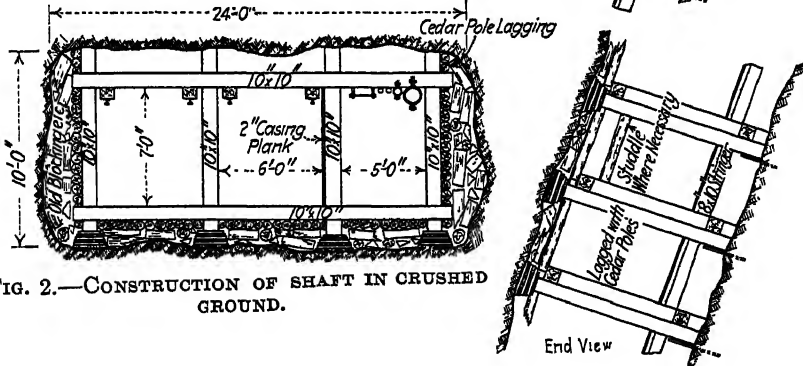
CONSTRUCTION OF SHAFT IN CRUSHED GROUND.
